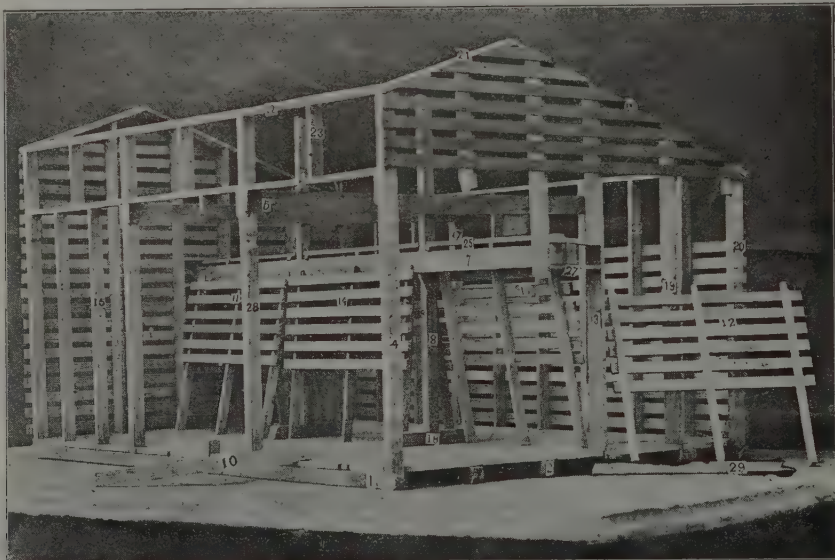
View with Side and End Boards and One Panel of the Ventilators Removed from Crib.
